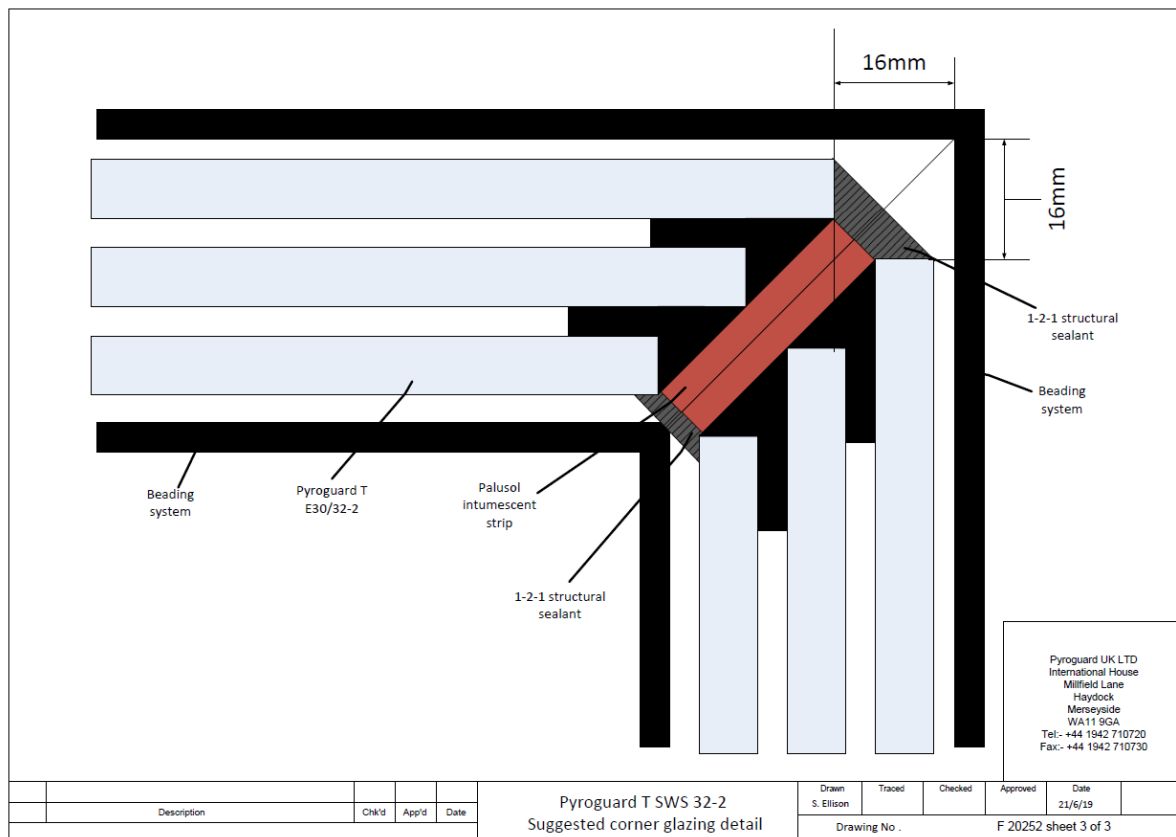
Technical drawing of 90° SWS corner joint detail illustrating subtract 16 mm rule
